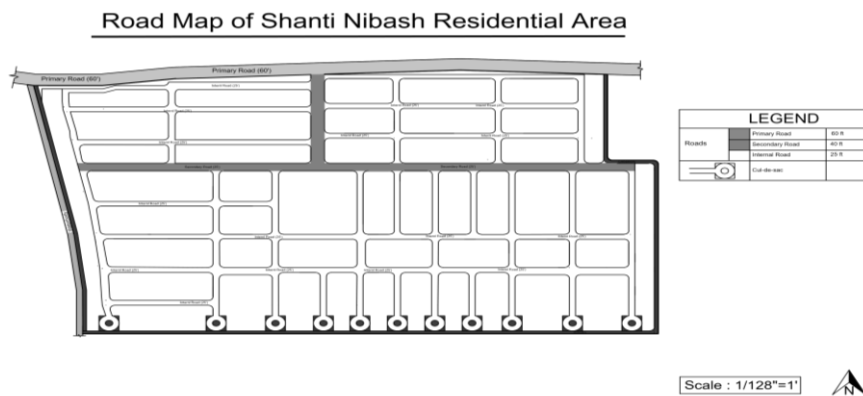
Distribution of Road Layout Plan of Shanti Nibash Residential Area.
